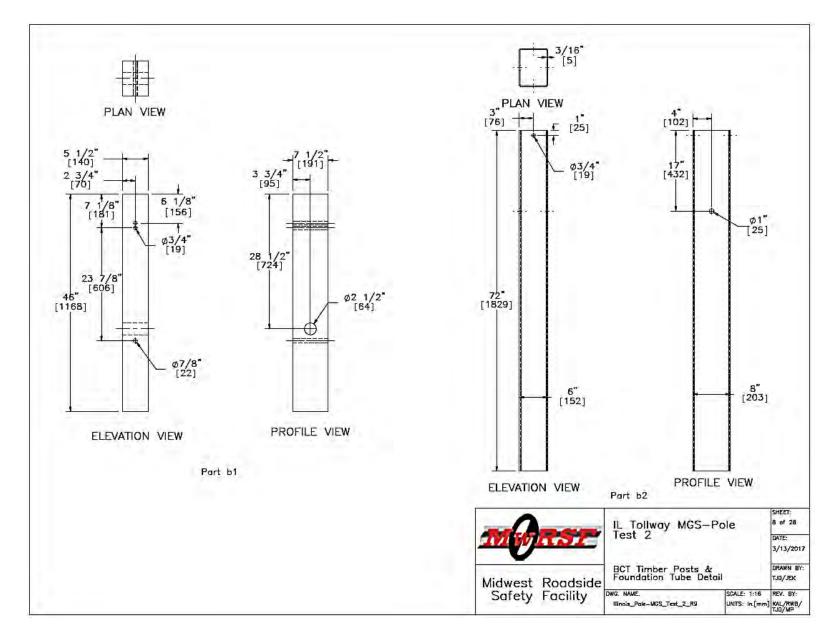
BCT Timber Posts and Foundation Tube Detail, Test No. ILT-2
